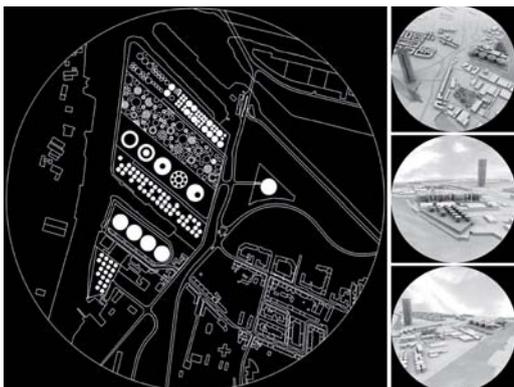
D. Radwański, European 8, Points, site plan and views, (source: own resources)
